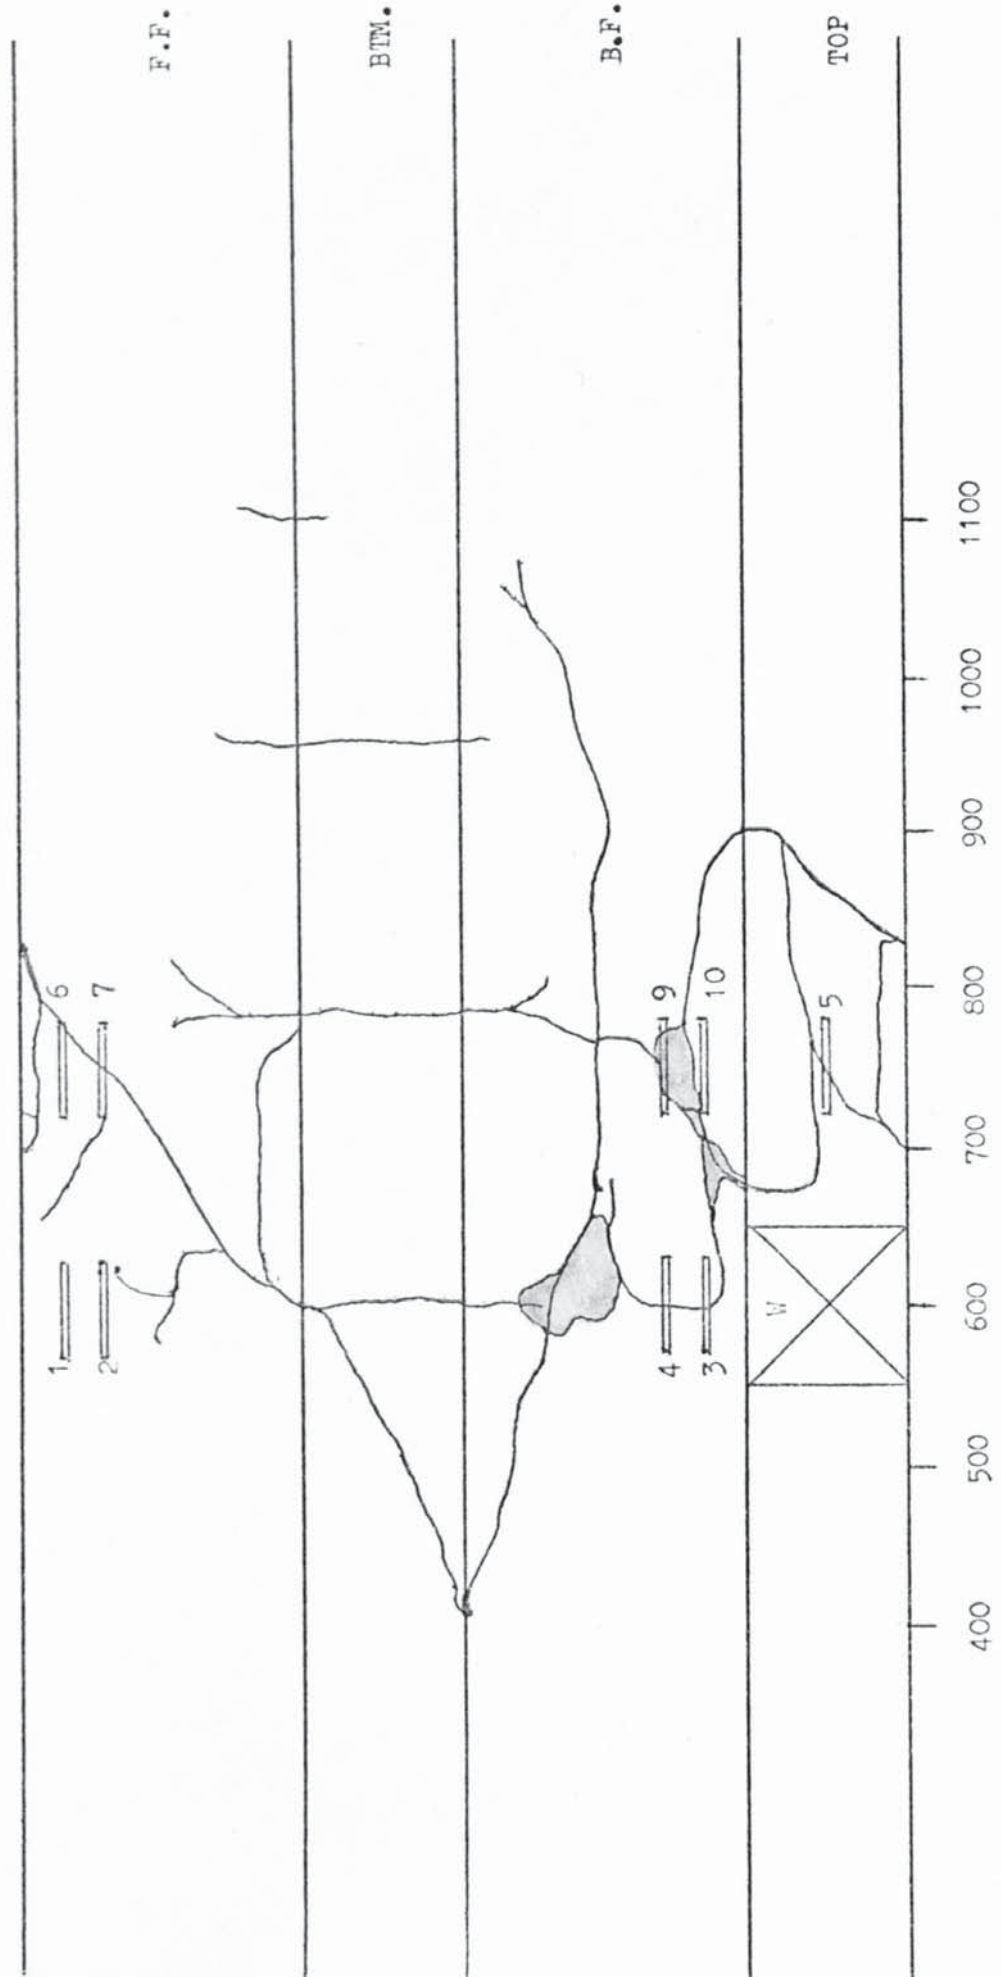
FAILURE CRACK PATTERNS - BEAM 17 (MODE 1/2)
